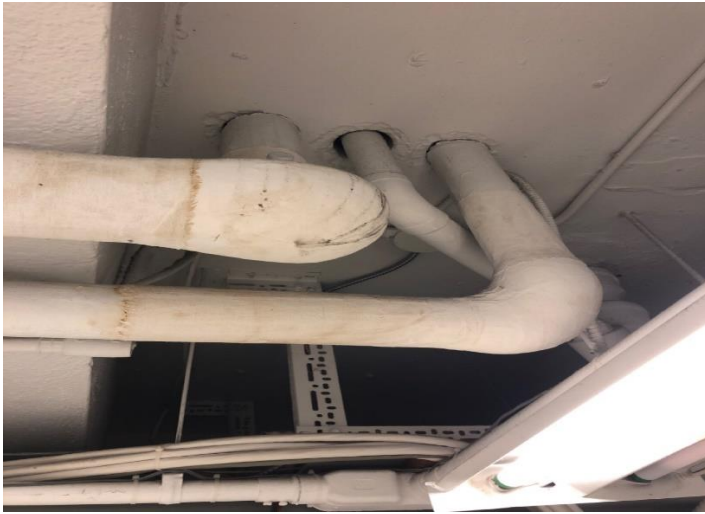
View of asbestos-containing pipe fitting insulation observed in Room 017.
